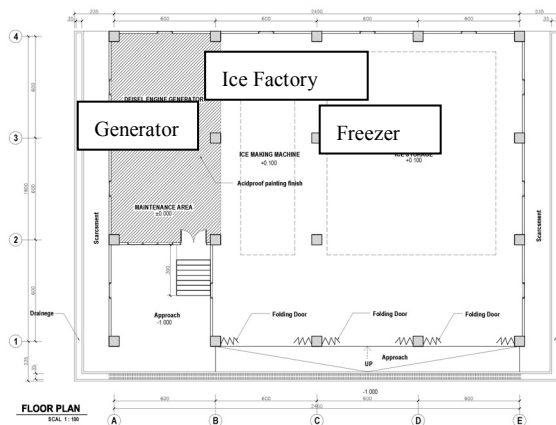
Ice Factory Floor Plan 28.7 m (W) x 20.35 m
